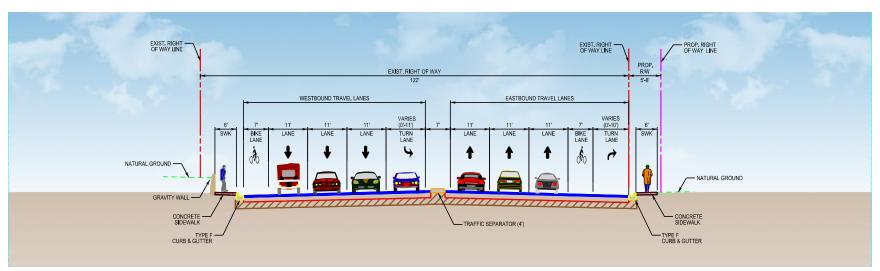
Typical Section - Lantana Road from High Ridge Road to Sunset Road
